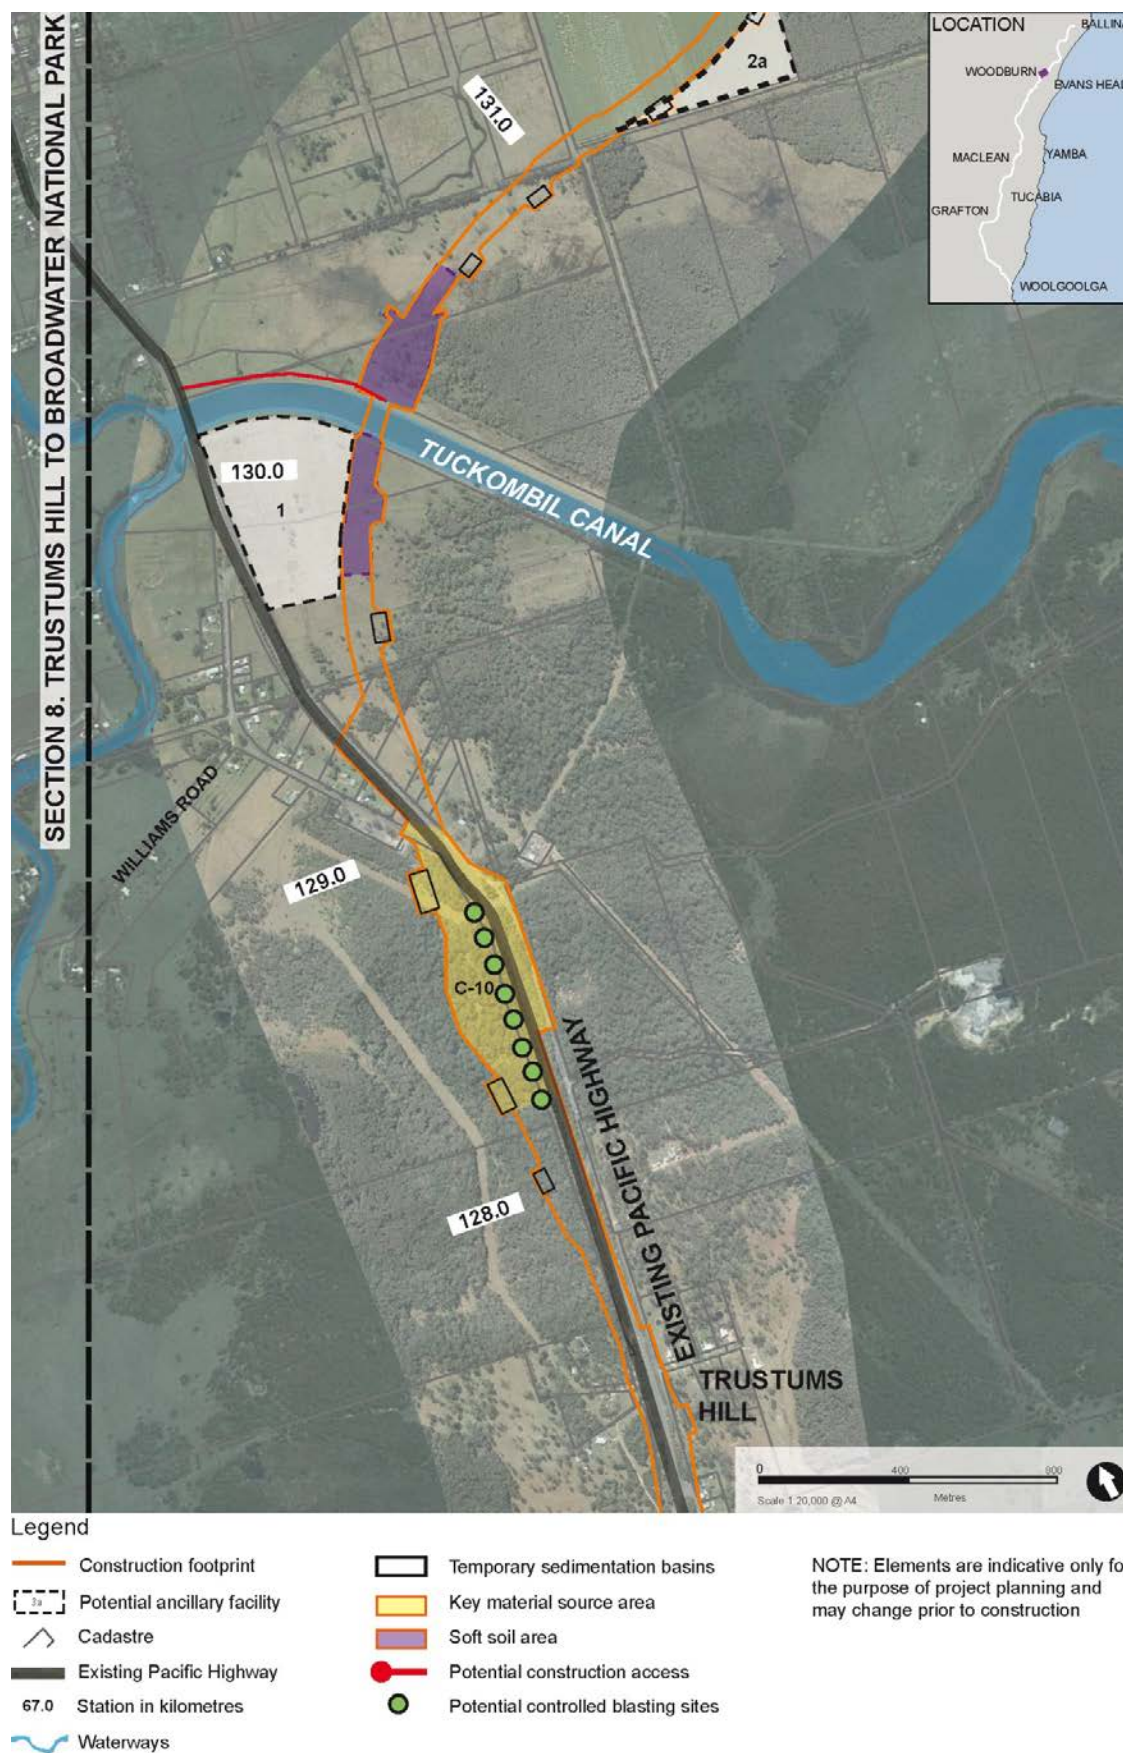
Extent of construction and construction features Section 8 (Station 127.2 to 131.5)
